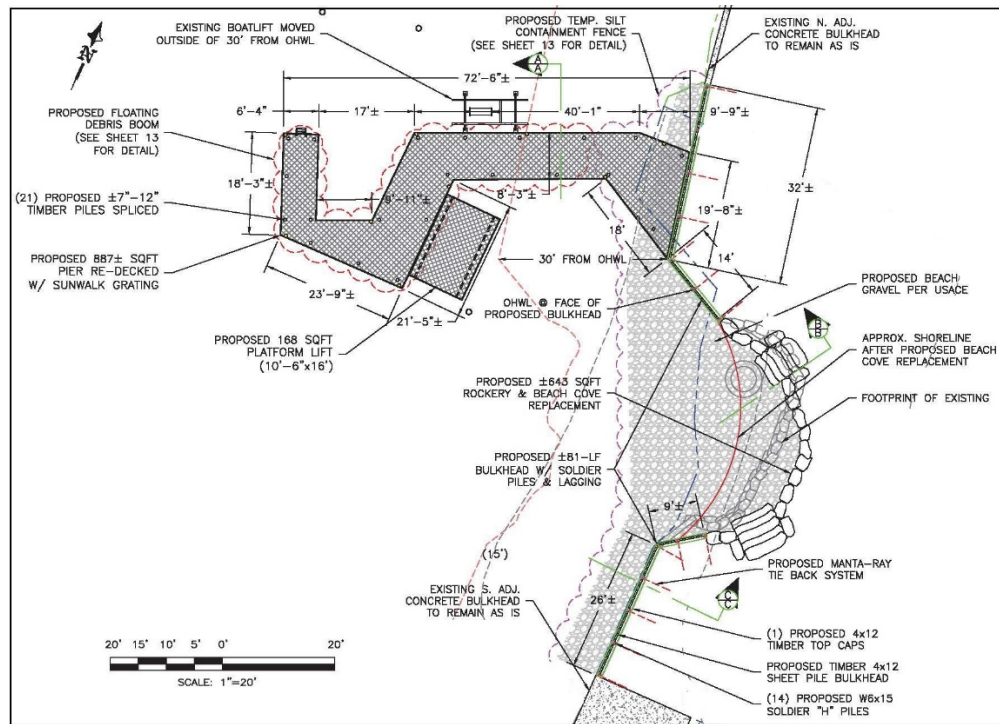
Plan drawings of the proposed dock from above (adapted with permission from Waterfront 2021d).
